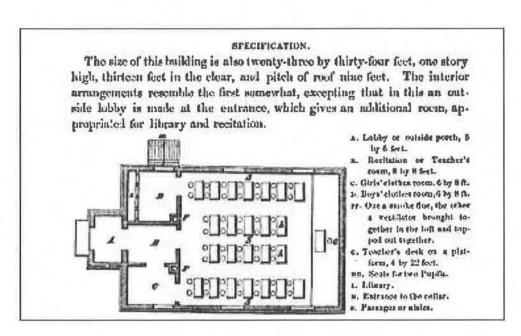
Thomas Henry Burrowes, Pennsylvania School Architecture: A Manual of Directions and Plans for Grading, Locating, Construction, Heating, Ventilation, and Furnishing Common School Houses. Harrisburg, PA: A. Boyd Hamilton, printer, 1855.
